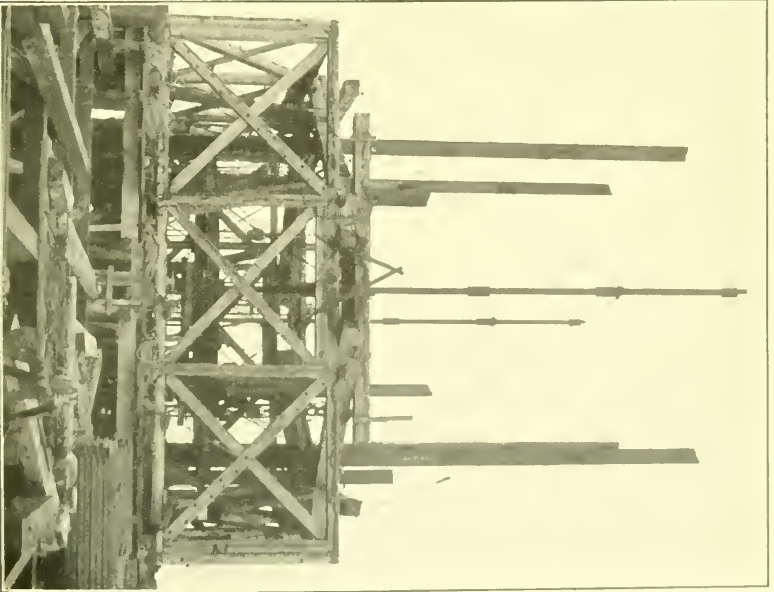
ERECTION OF FALSEWORK FOR PIVOT PIER, DUMBARTON POINT DRAW.
